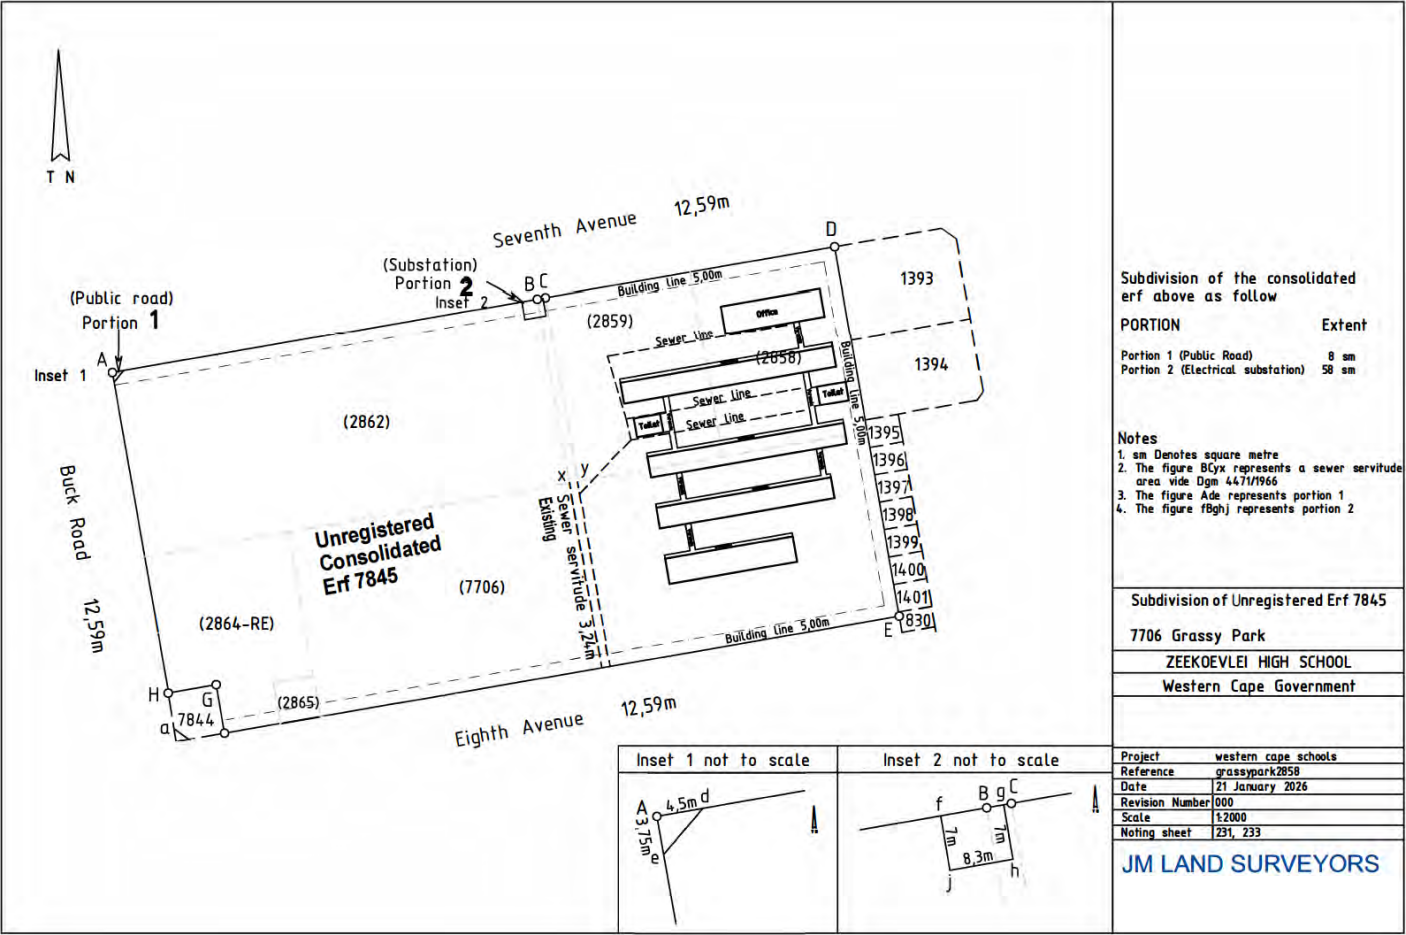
EXISTING SEWER SERVITUDE LOCATED ON ERF 7706 ALONG WITH AN EXISTING SUBSTATION LOCATED ON ERF 2862 AND THE EXISTING ROAD SPLAY LOCATED ON THE TOP LEFT CORNER OF ERF 2862.
